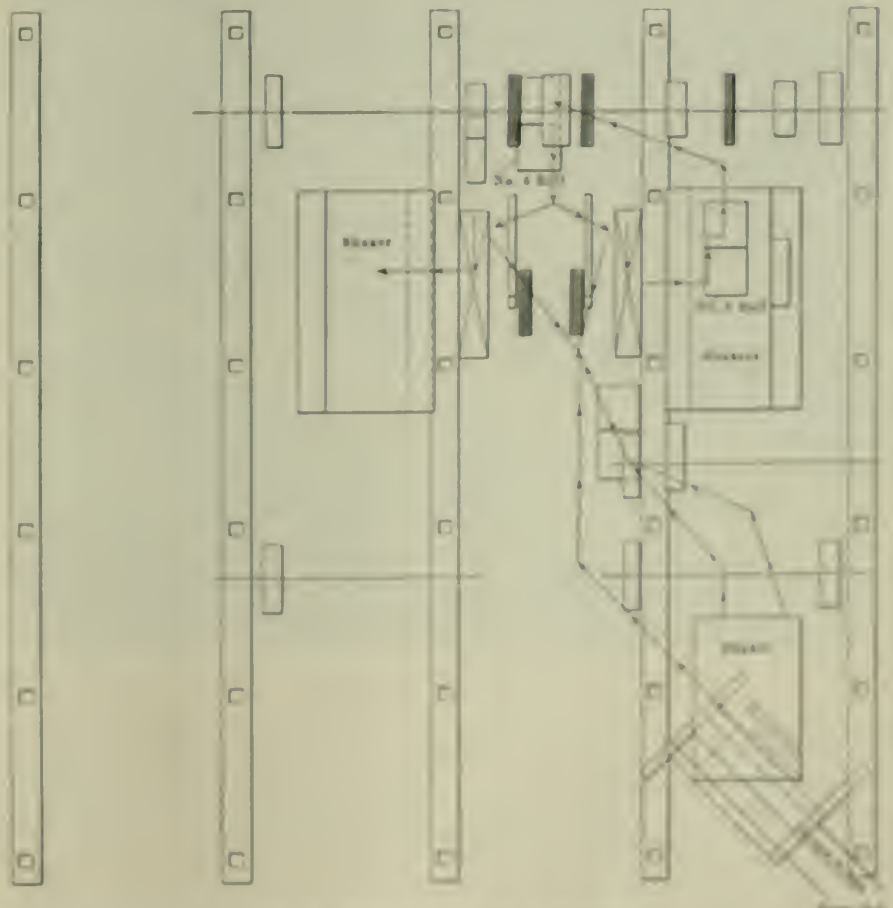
PLAN VIEW OF NO. 2 WASHERY
